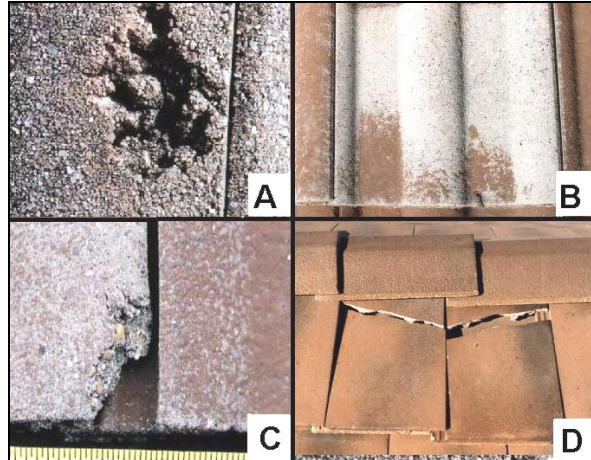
Concrete tile defects not caused by hail: a) concrete void, b) lack of slurry coat, c) missing tile corner, and d) broken tiles from foot traffic.
